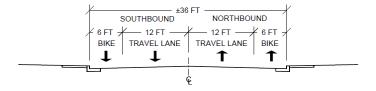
Proposed Typical Section between Jessie Lane and Vincent Street
